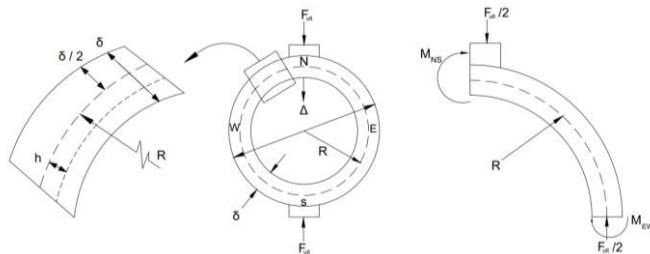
Edge Bearing Test Specimen Geometry and Internal
